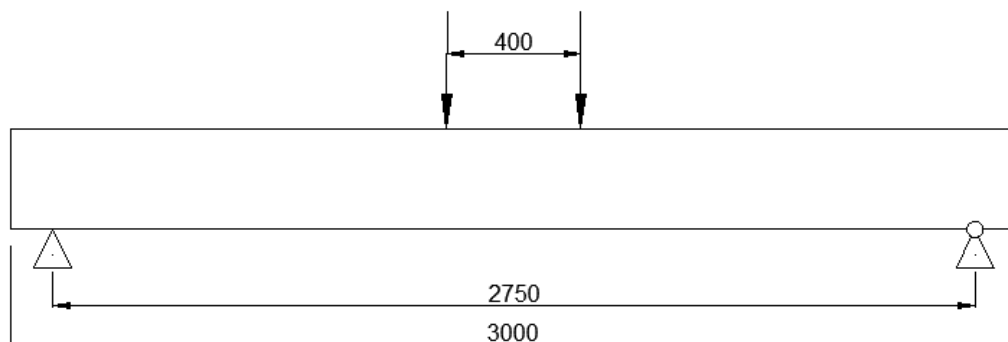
Morenon et al. (2019) experiment beam size, load location & support conditions (all dimensions are in mm)
